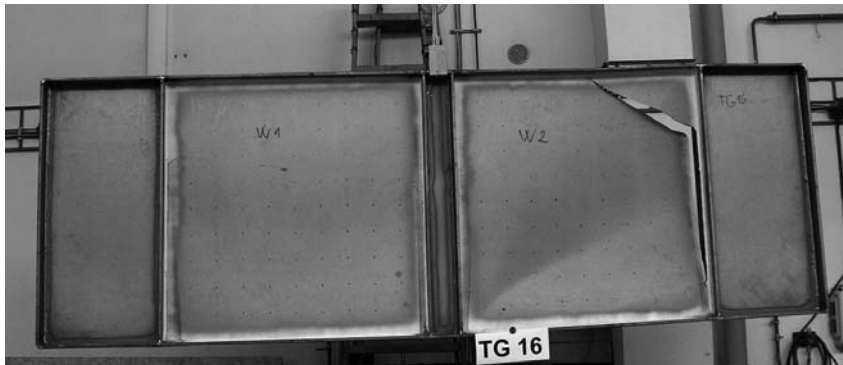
The failure mechanism of one of the test girder subjected to repeated loading
